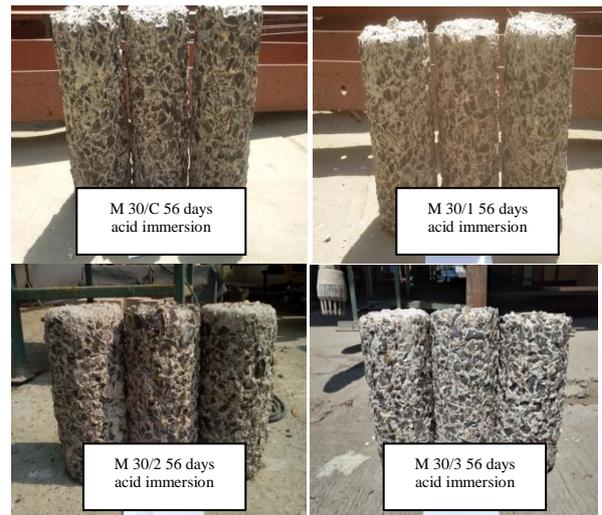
M 30 grade concrete specimens after 56 days in an acid immersion
